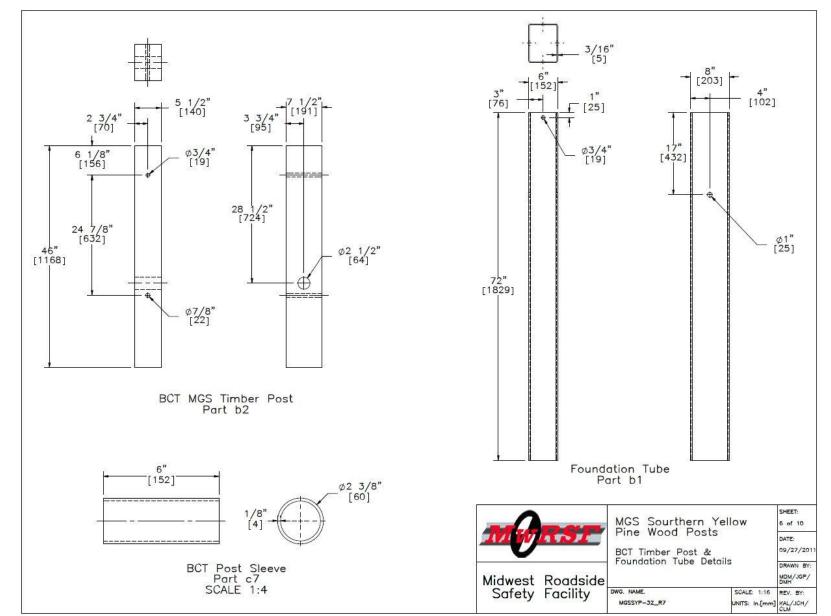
BCT Timber Post and Foundation Tube Details, Test No. MGSSYP-2
